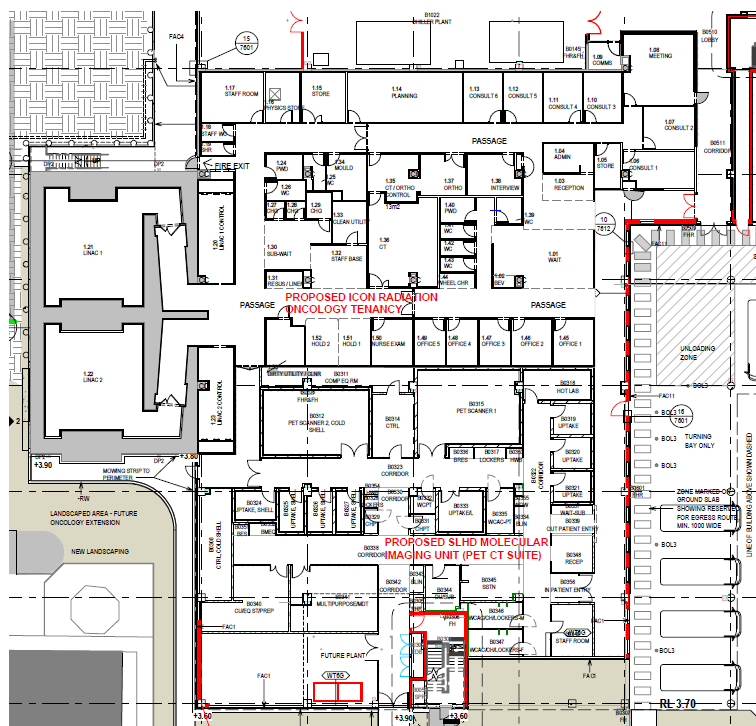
GA- BASEMENT LEVEL ZONE 2 RL 4.0 (Proposed Modification 6 Plan)
